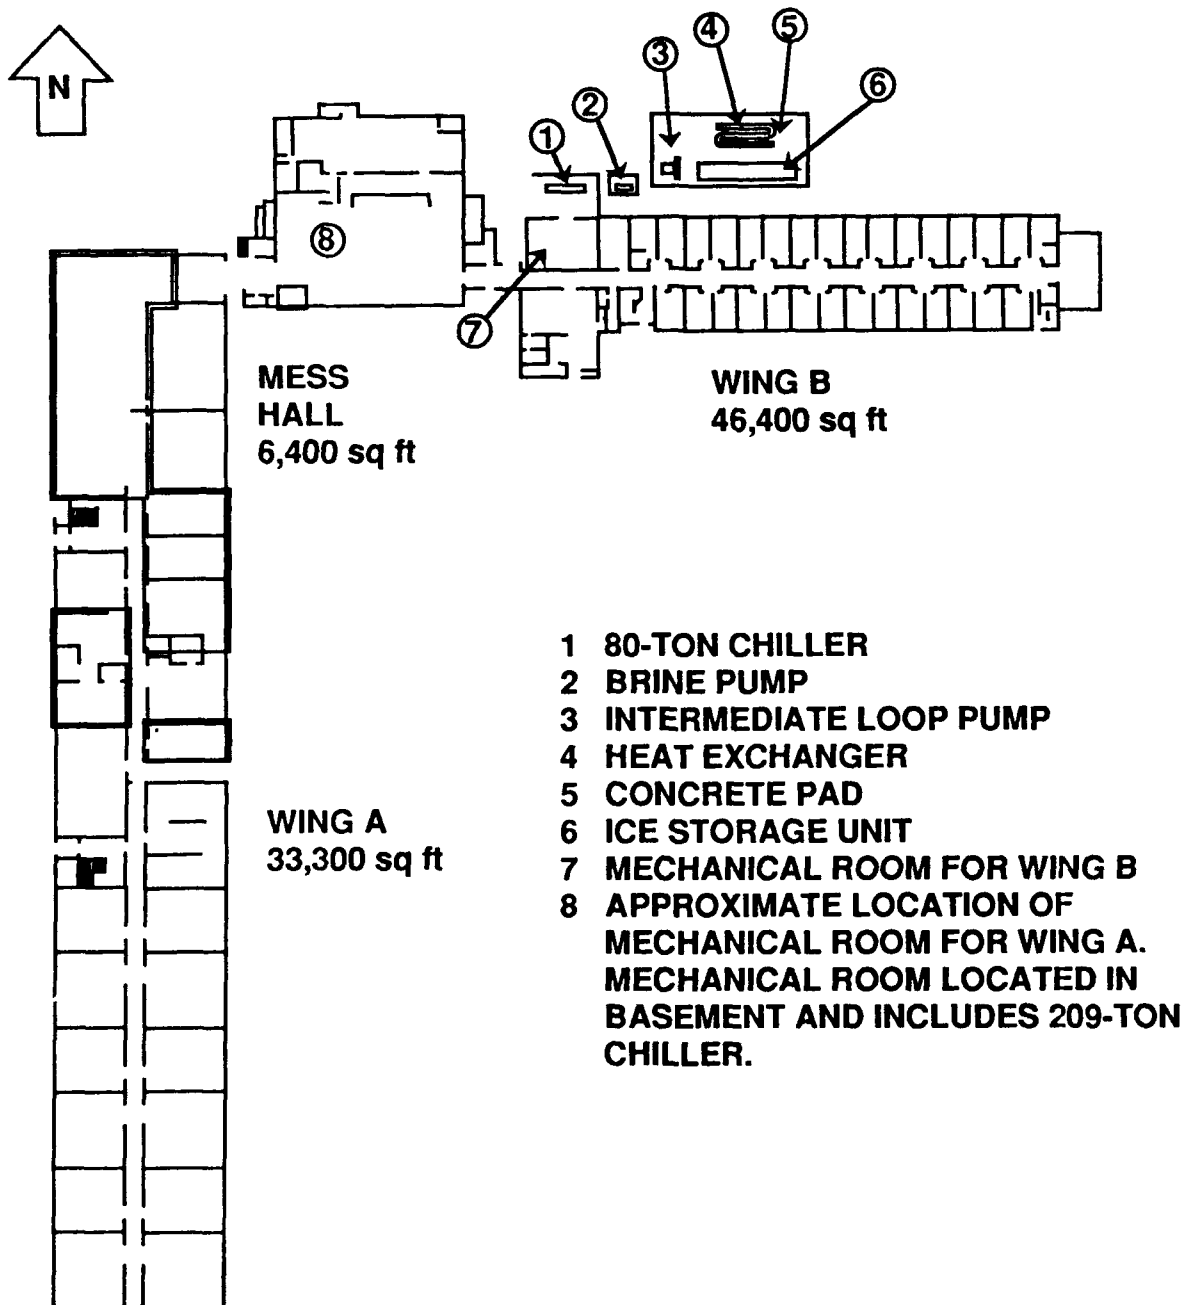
Plan view of Building 506 with layout of DIS equipment.
